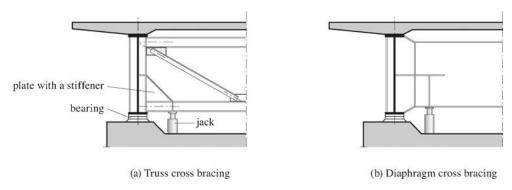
Examples of detailing of the cross bracing to allow jacking of the bridge.
